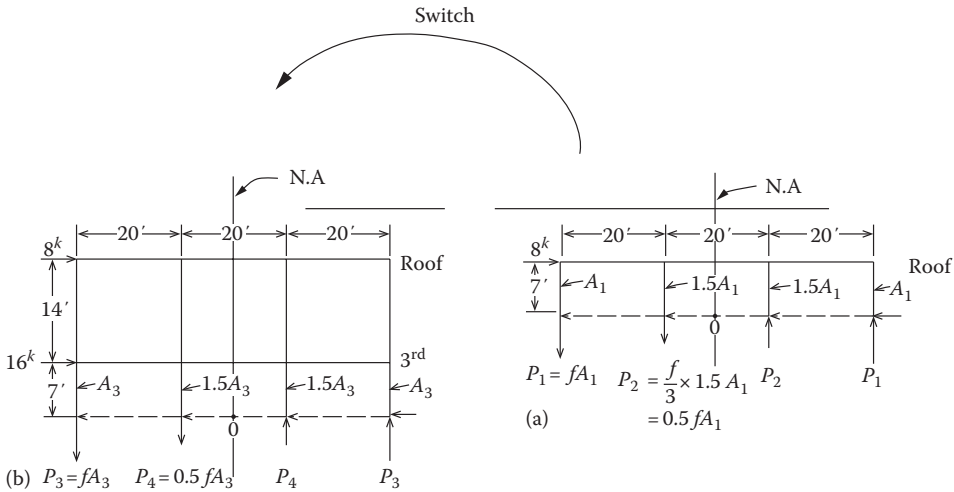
Cantilever method: (a) column axial forces below roof and (b) column axial forces below level 3.
